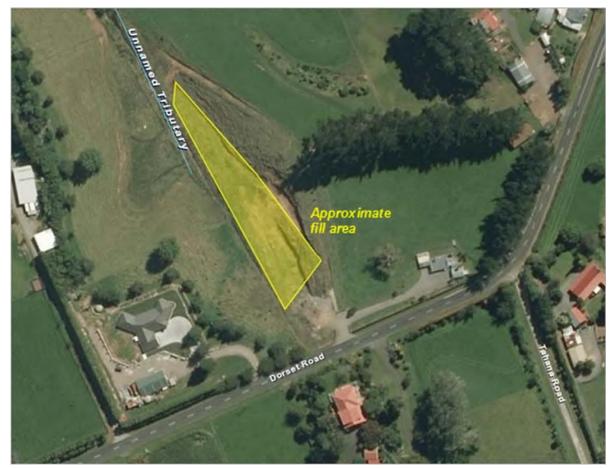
Downer EDI Works Ltd cleanfill, Dorset Road, New Plymouth
